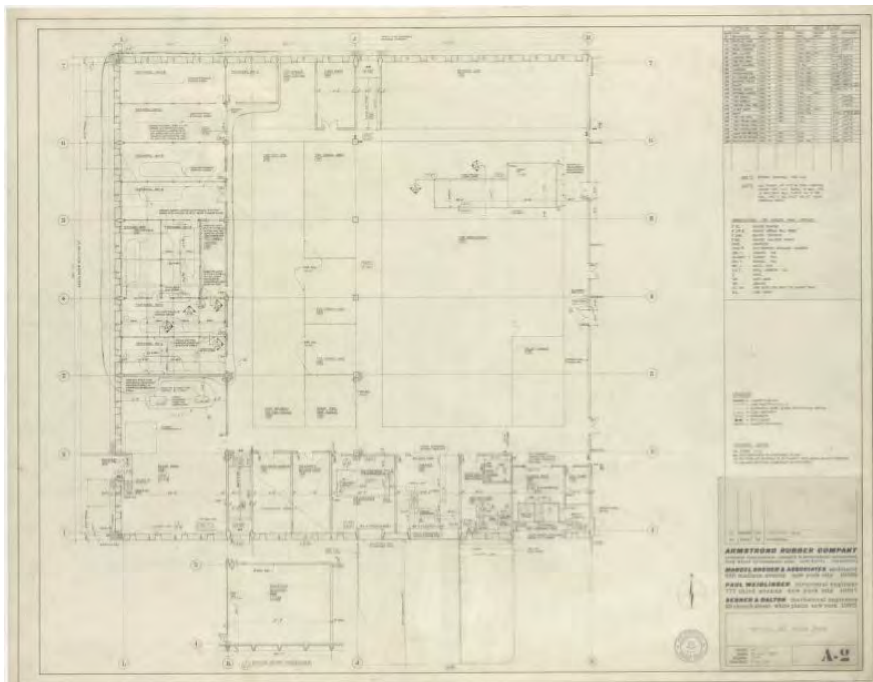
Partial 1st Floor Plan, pilot plant (Source: Marcel Breuer Digital Archive, Syracuse University)
